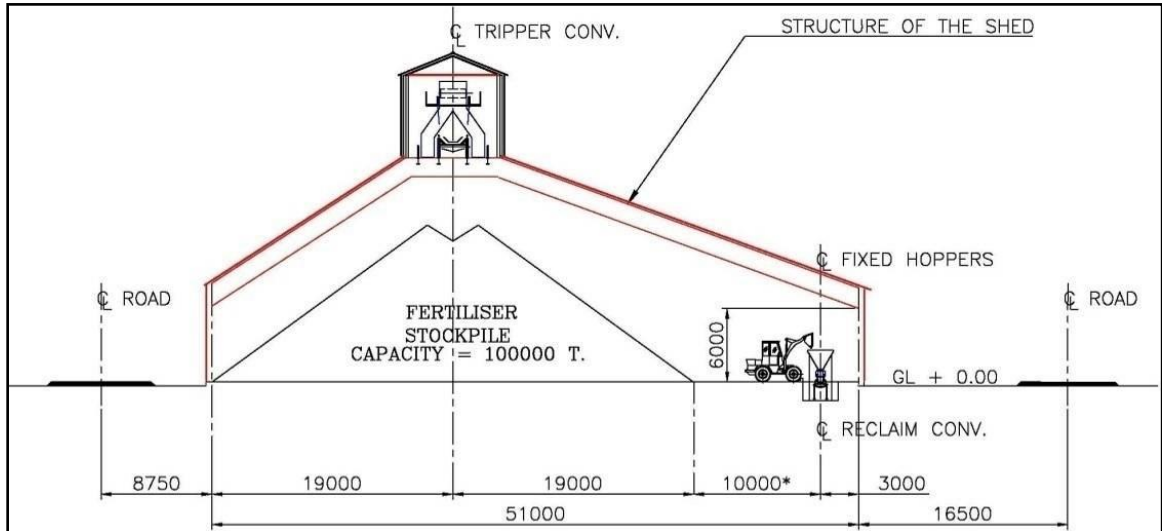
Layout showing covered and enclosed storage for fertilizer
